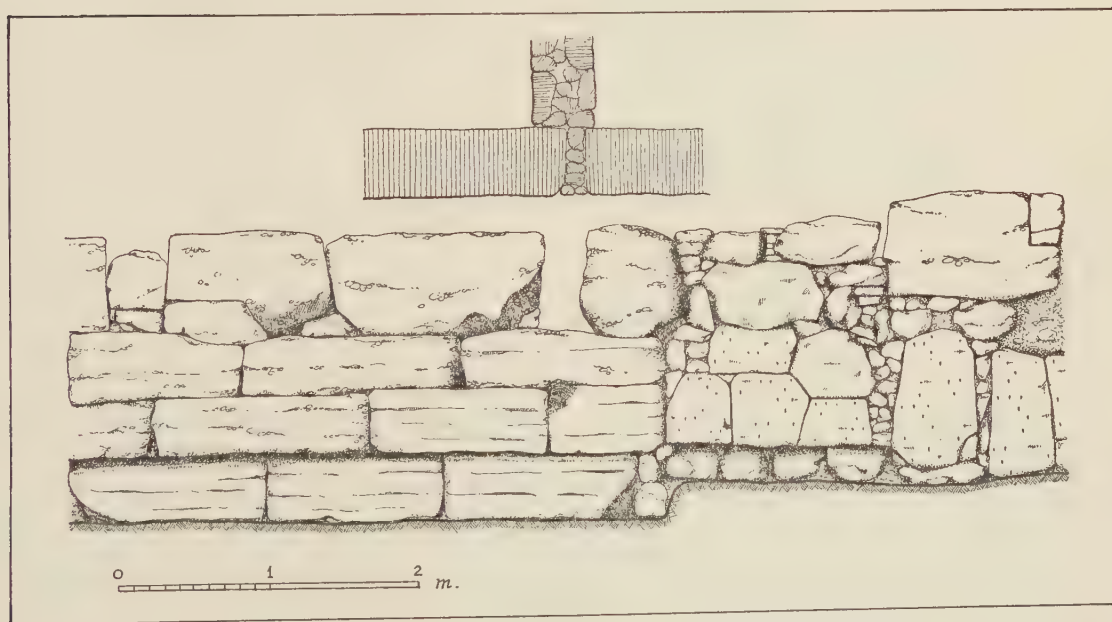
East Wall of Drain from House J to House K: Elevation Showing Change of Construction, and Plan to Show Return of North Wall of House K.
